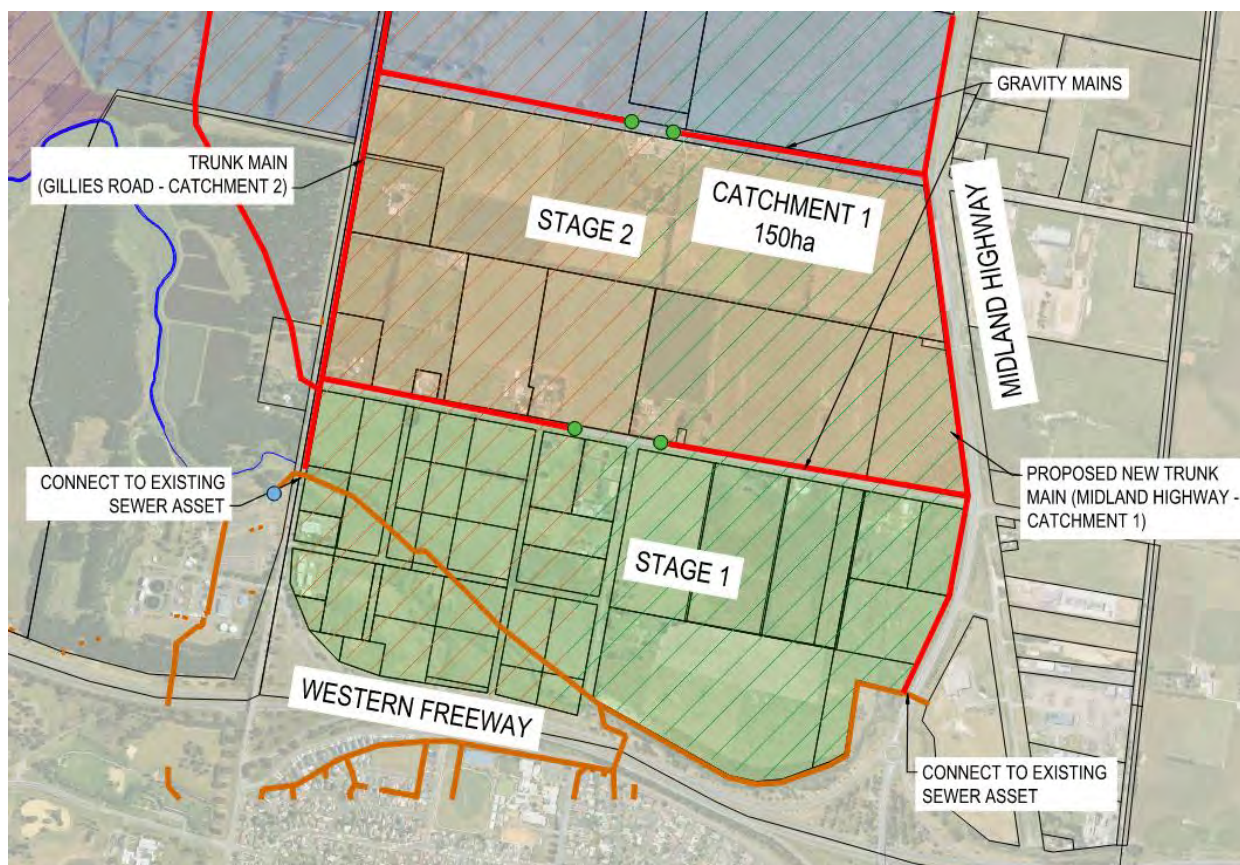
Proposed new Sewer Infrastructure (Stage 1 & 2)
